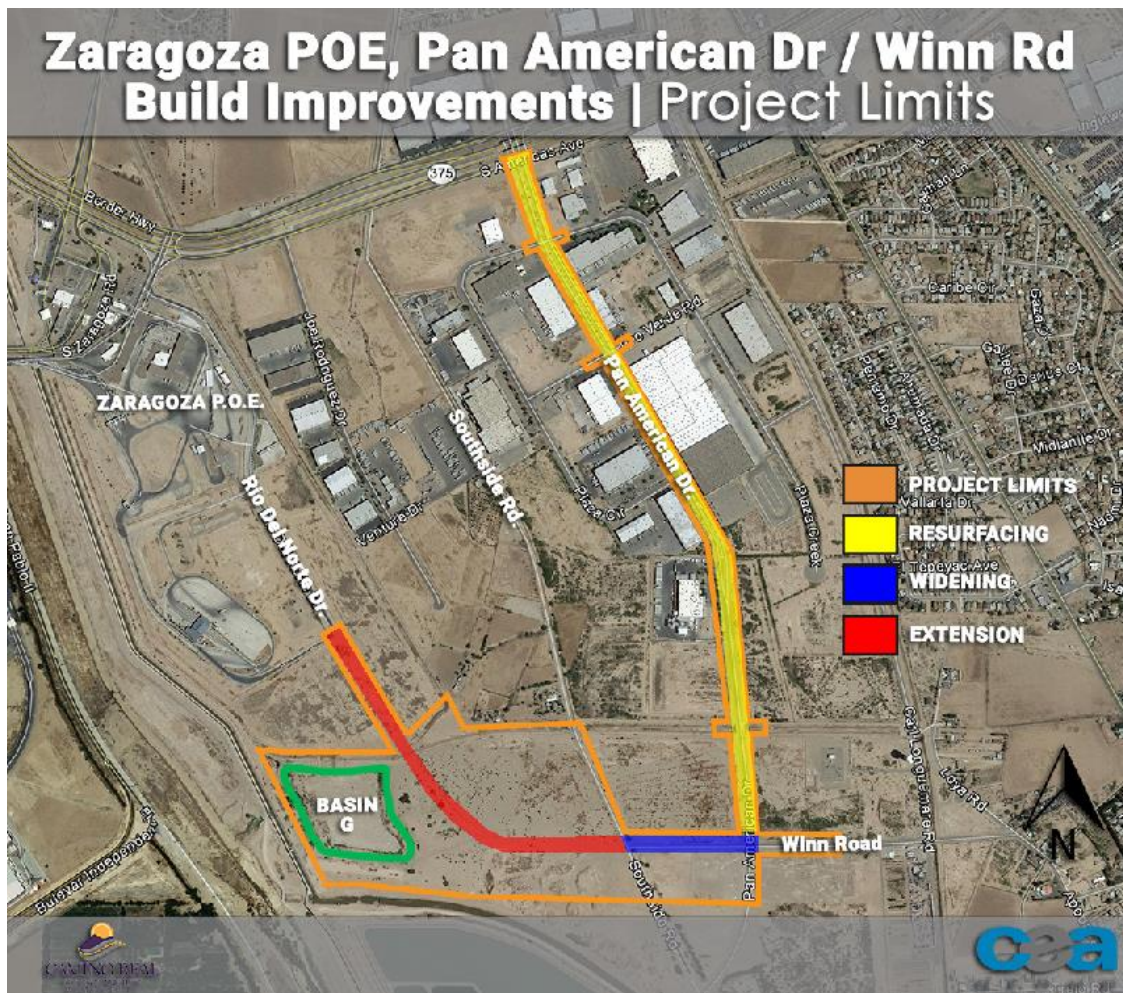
Zaragoza POE, Pan American Dr./Winn Rd. Build Improvement Project Limits
